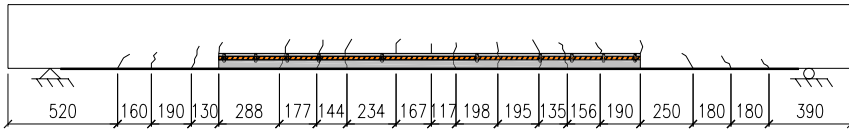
Crack pattern after failure test for repaired and strengthened beam.
